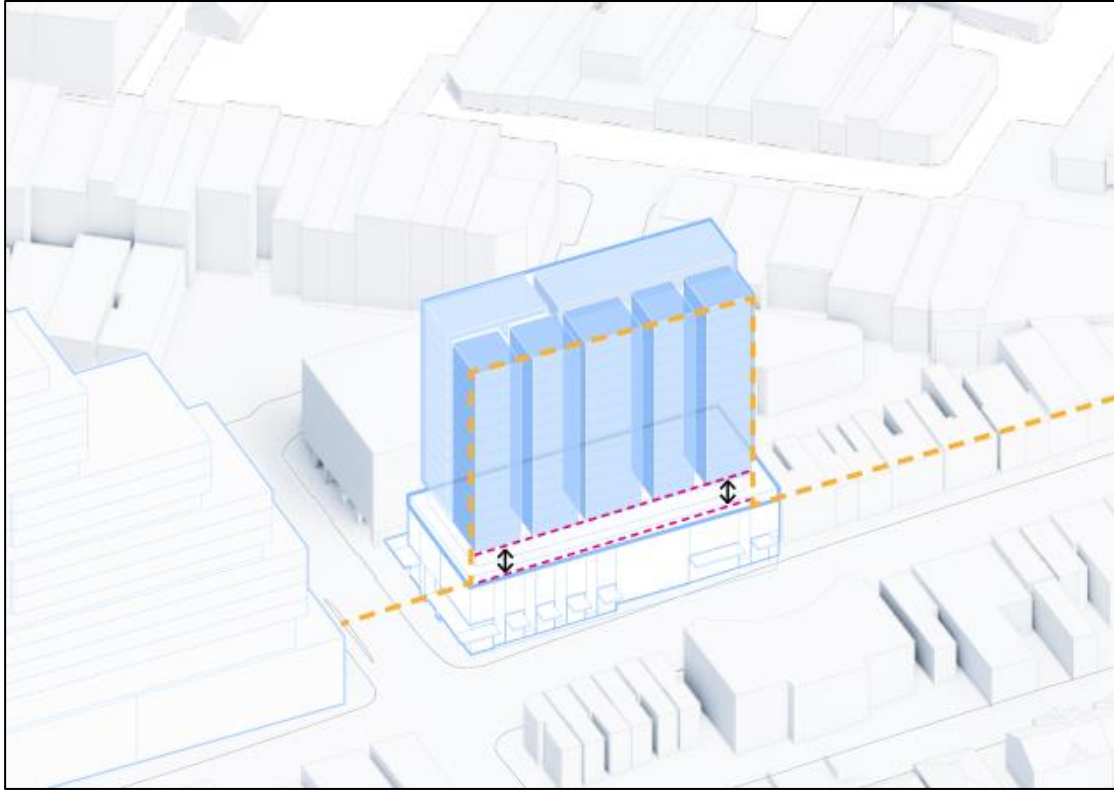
Horizontal Modulation (Source: Woods Bagot, 2024)
